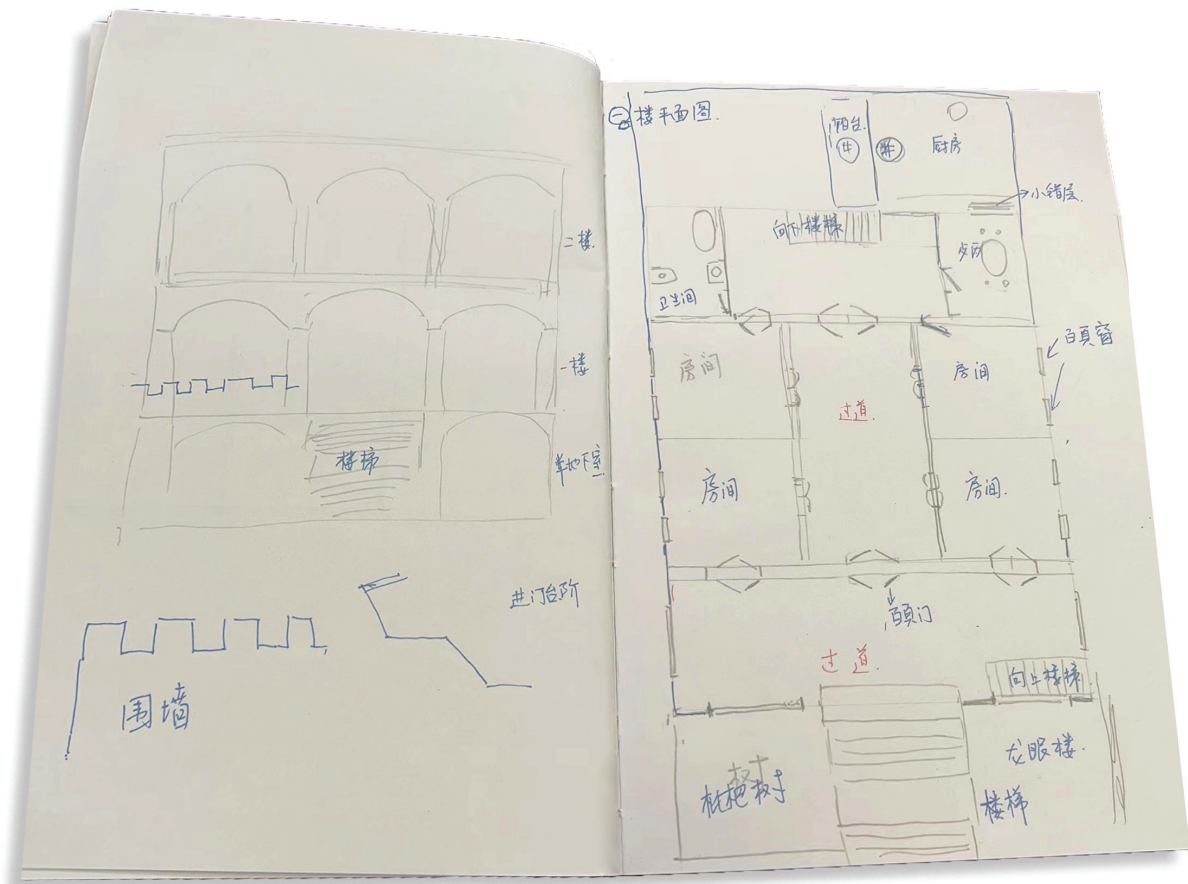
My mother's second attempt of drawing the house, with the front elevation, section of the grand stairs, some close-up drawing of the railings on the left side; and the ground floor plan drawn on the right side.
